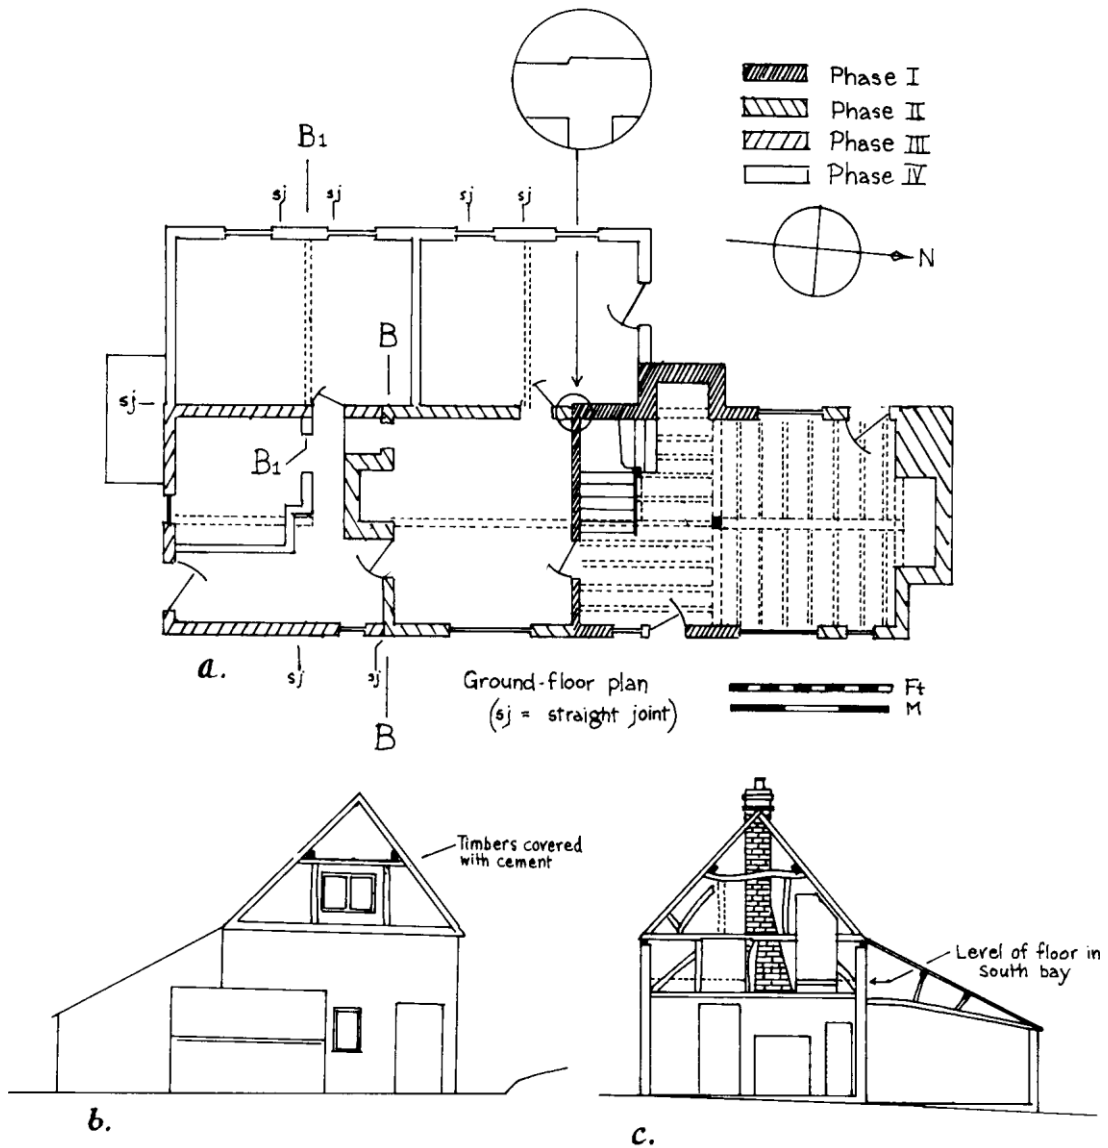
Dell Cottage: the earliest part has its joists running north-south, (a) Ground plan, (b) South elevation, (c) Section at B-B, B₁-B₁.
